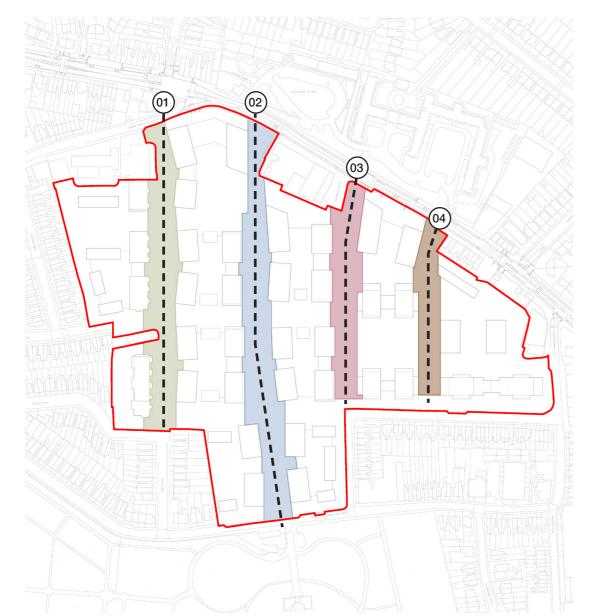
Four key spaces: Washington:Piper (01 - Washington Avenue and Piper Way), Madingley:Willingham (02 -Madingley Avenue and Willingham Way), Croxton Avenue (03) & Stapleford Way (04) - Plan diagram
